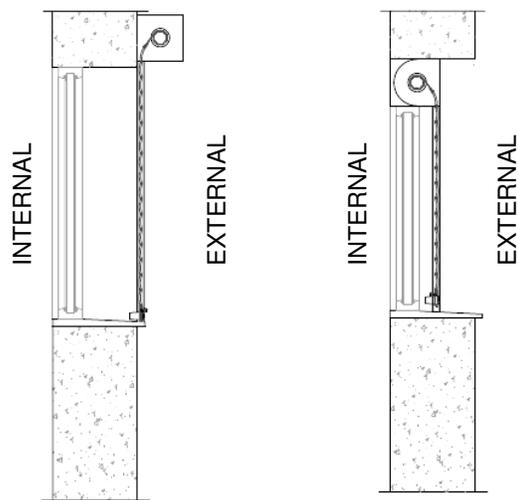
Section through external blind installation: retrofit (left), compact (right)
